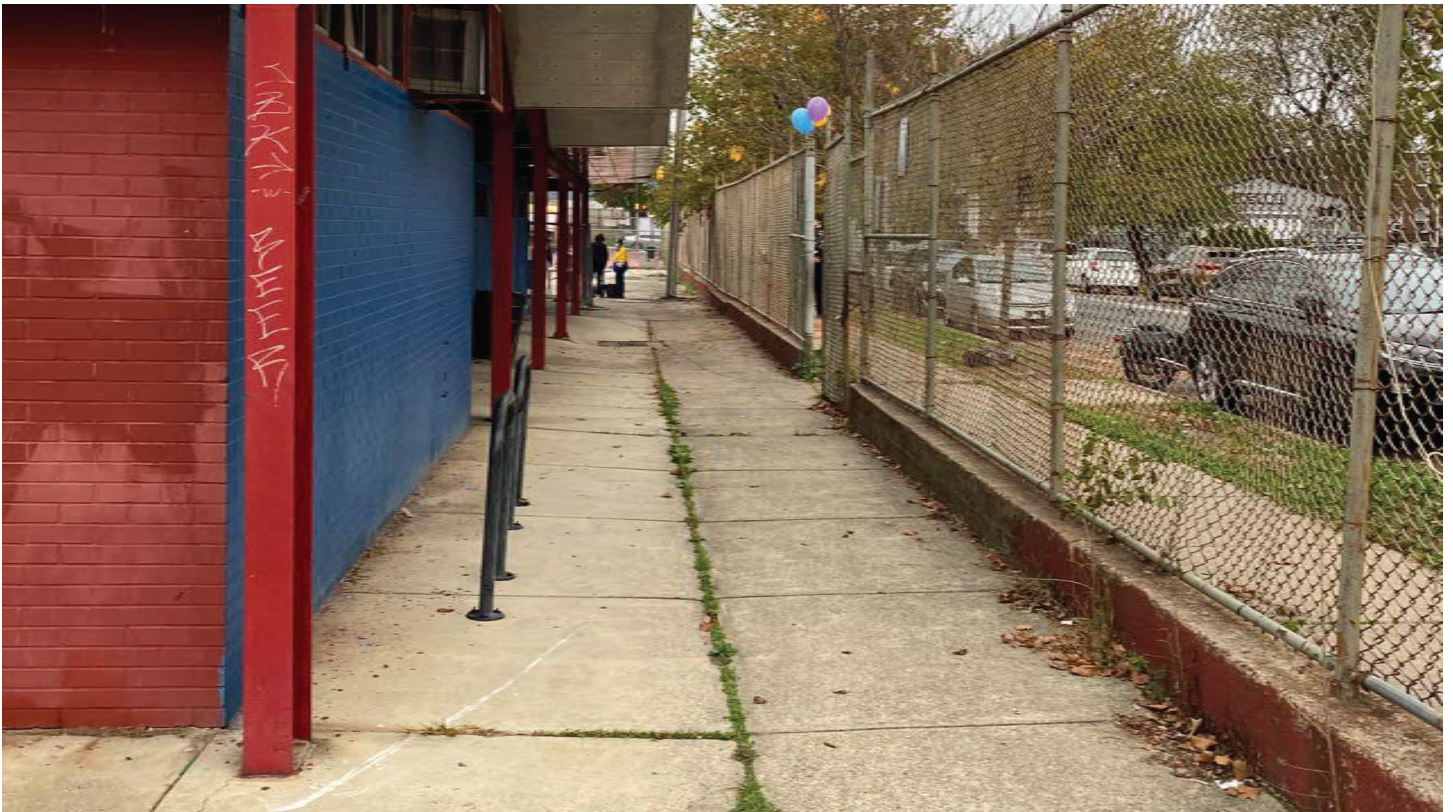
Existing east side of the building that runs parallel to B Street.
